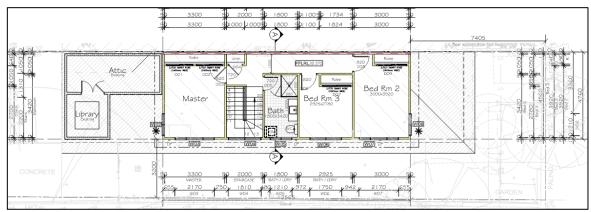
Proposed First Floor Plan (Sydney Drafting Concepts & Design).
